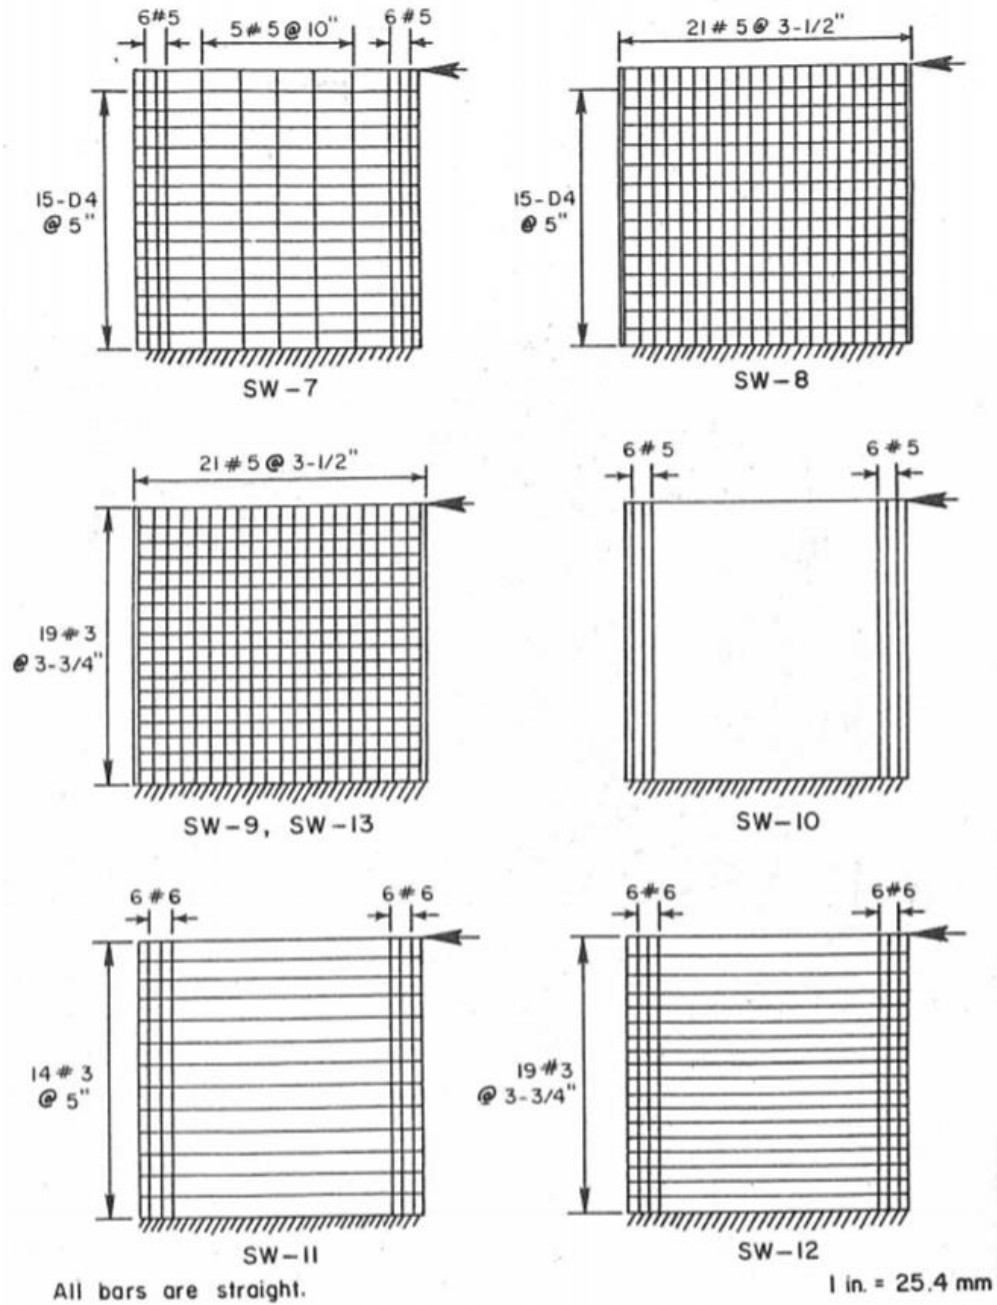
Reinforcement layout of tested walls (Cardenas et al., 1982)
